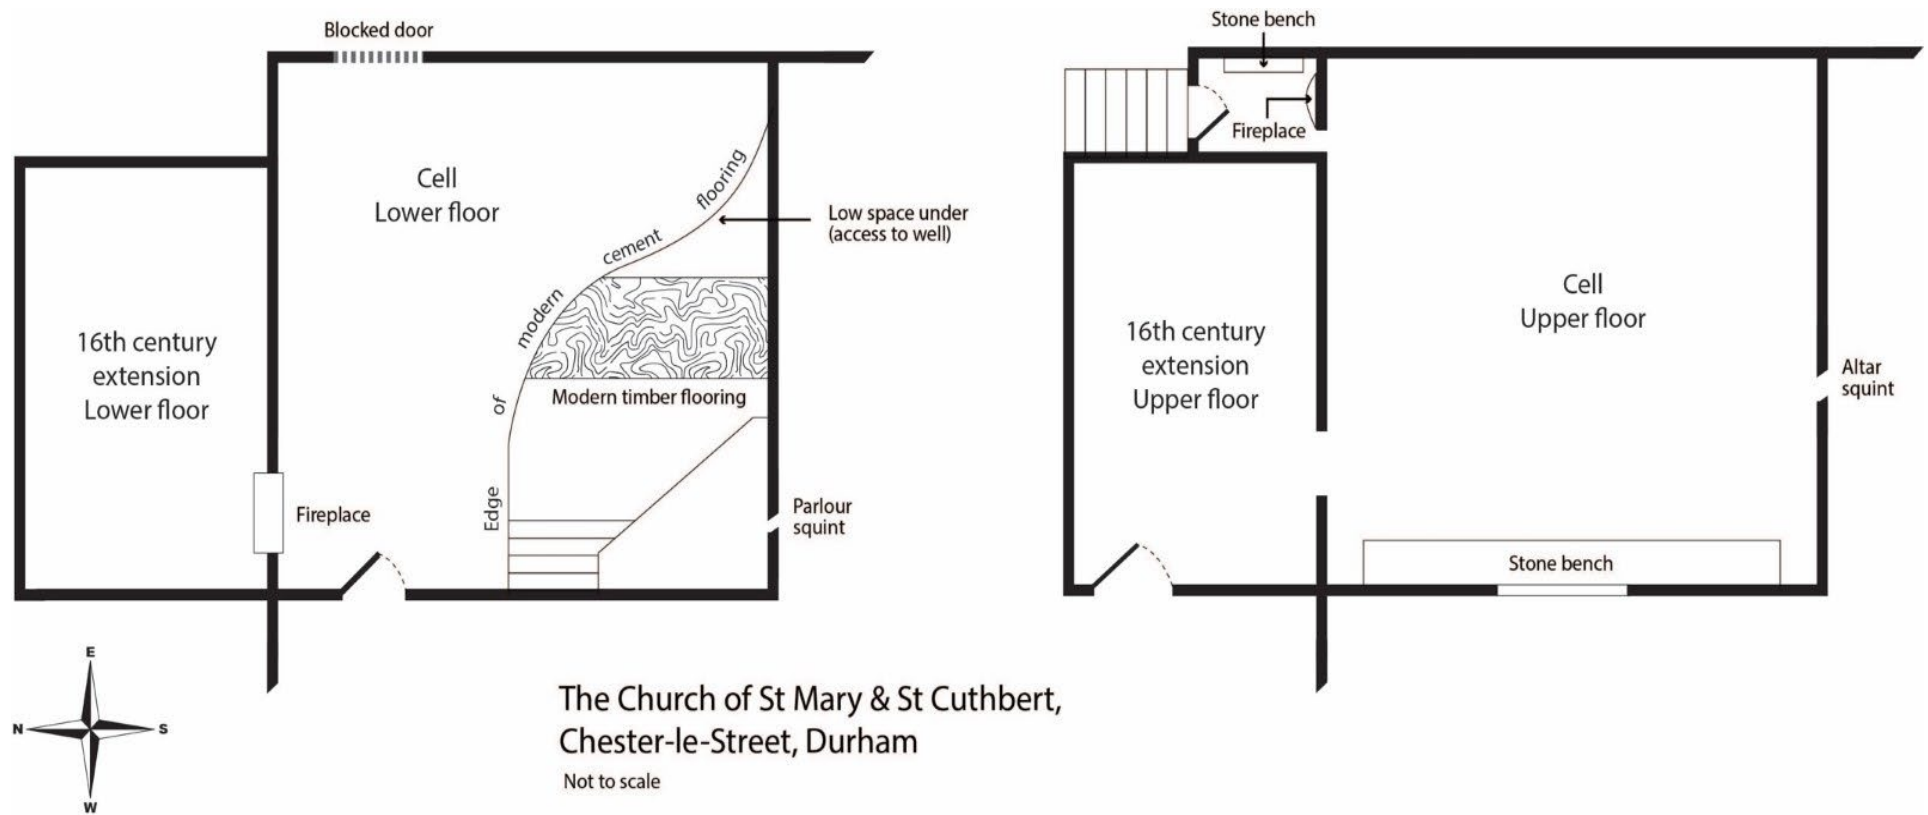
Floor plan of the anchorite cell of St. Mary and St. Cuthbert's church of Chester-le-Street, Durham
